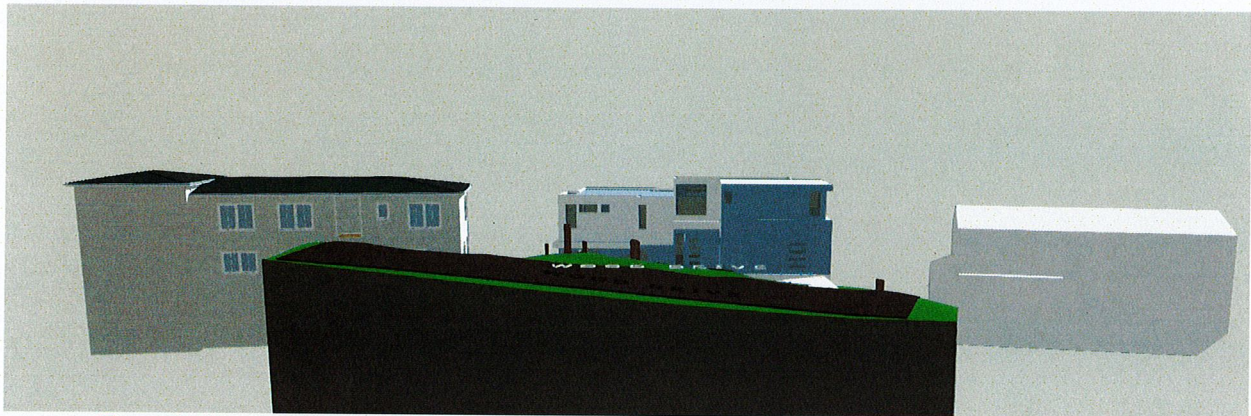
Massing at Front Elevations (Left: 6311 Wood Dr, Center: Subject Parcel, Right: 6303 Wood Dr)
